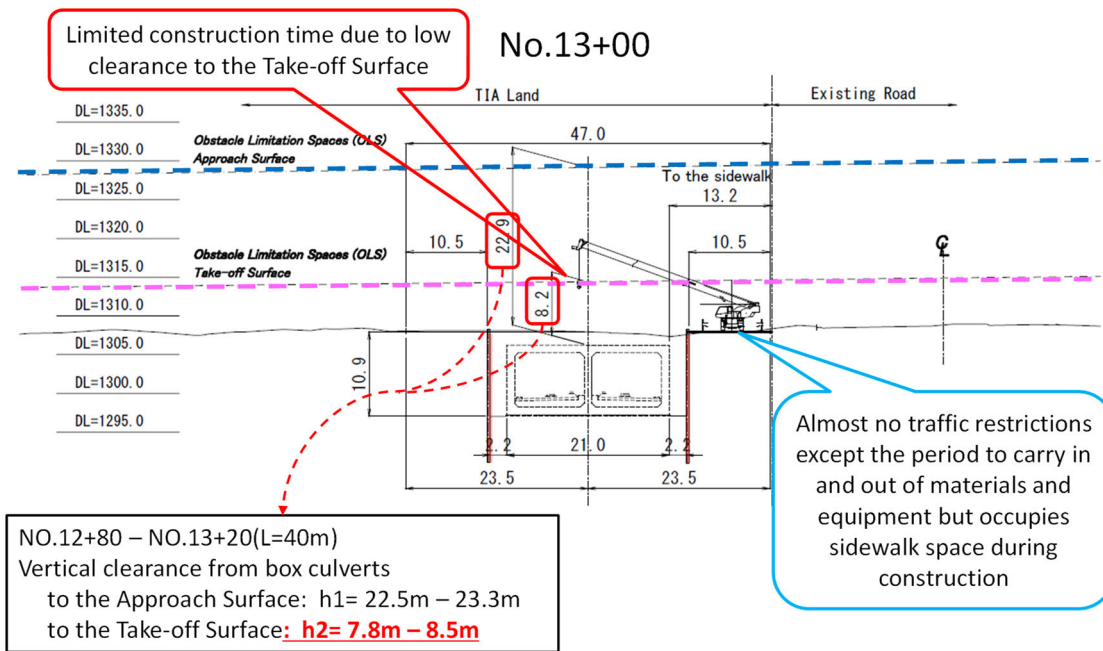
Section-2(Zone-2) Tunnel
